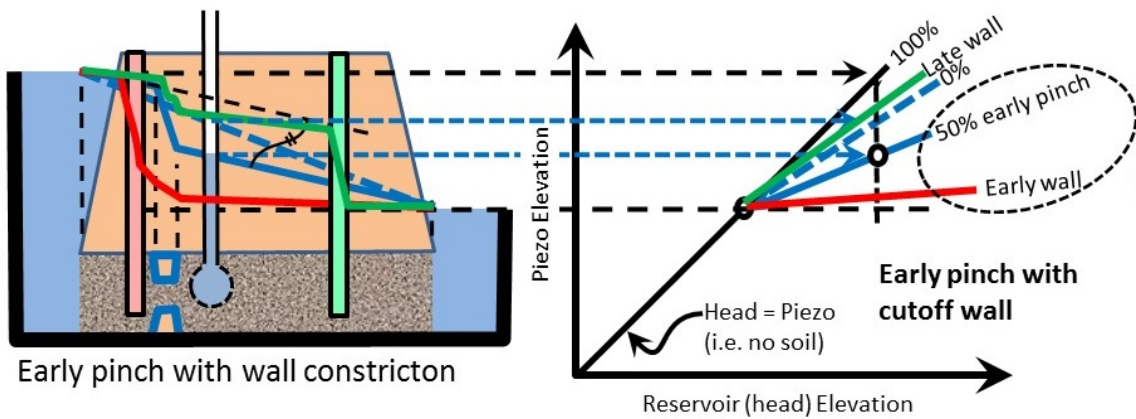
Cutoff wall construction with an early pinch and resulting R-P trend.
